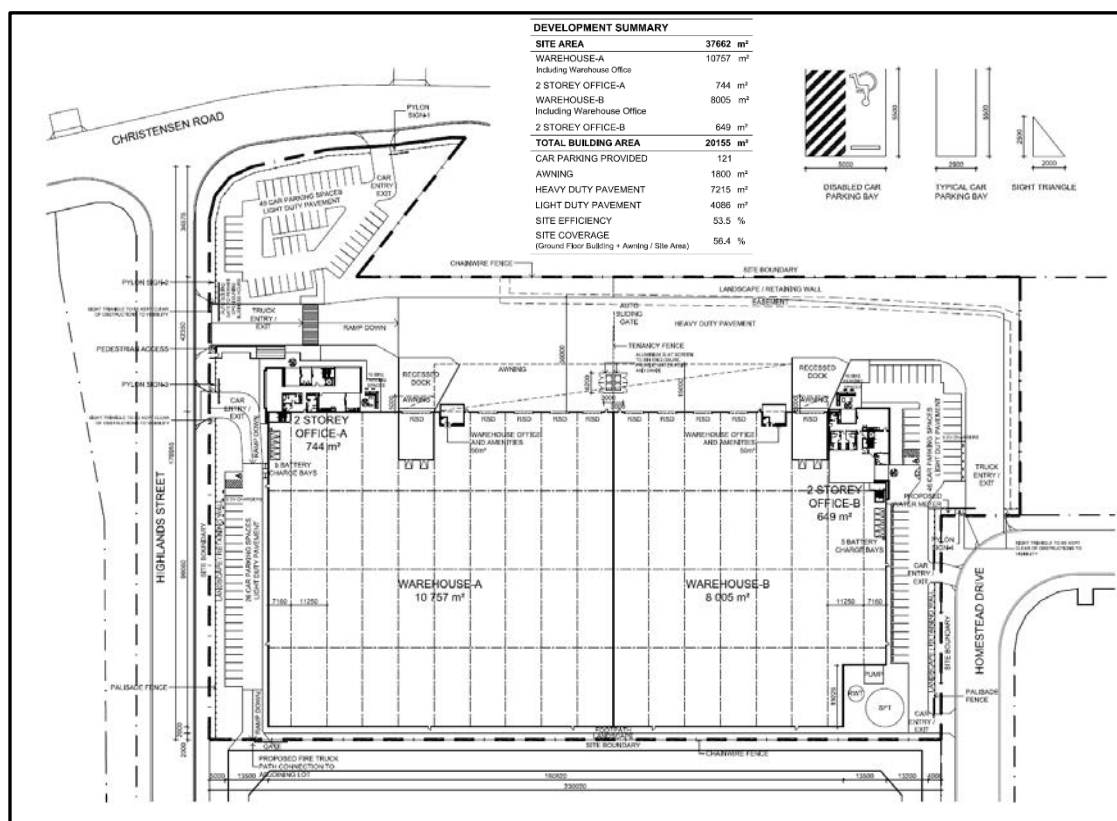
Proposed Warehouse development (GDP File, 2024)
